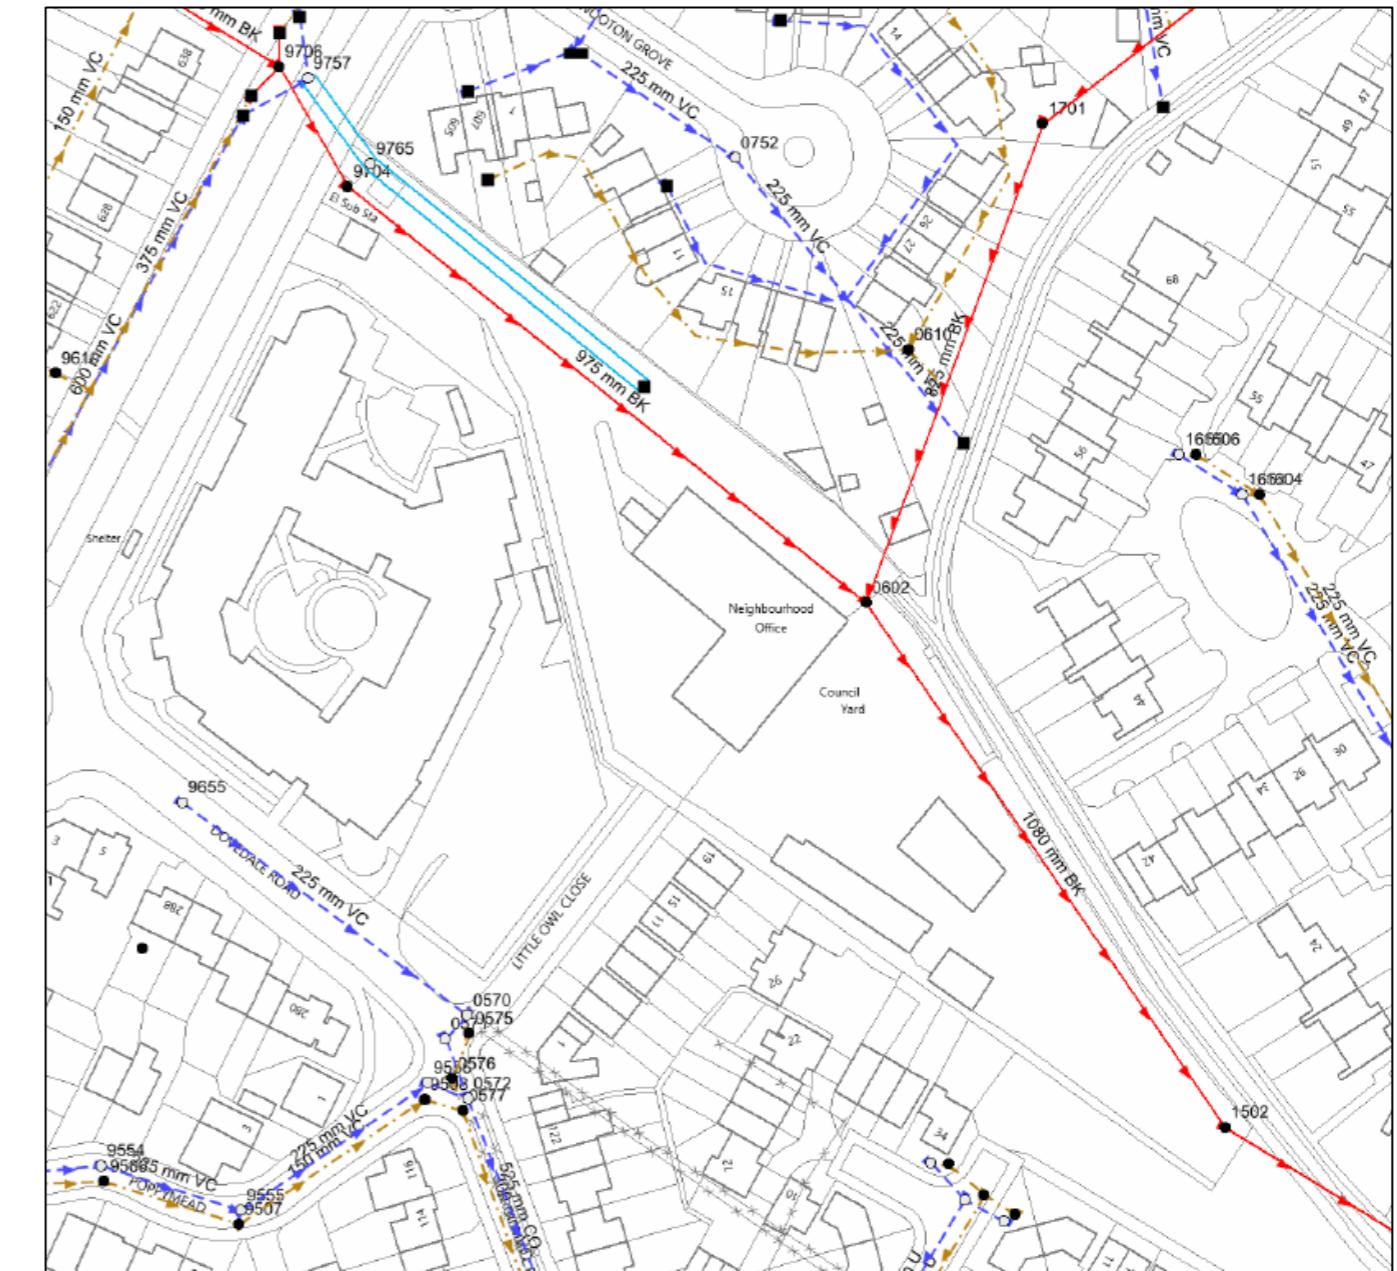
Plan of Severn Trent services (Public combined Gravity/Lateral Drain) running beneath College Road.
